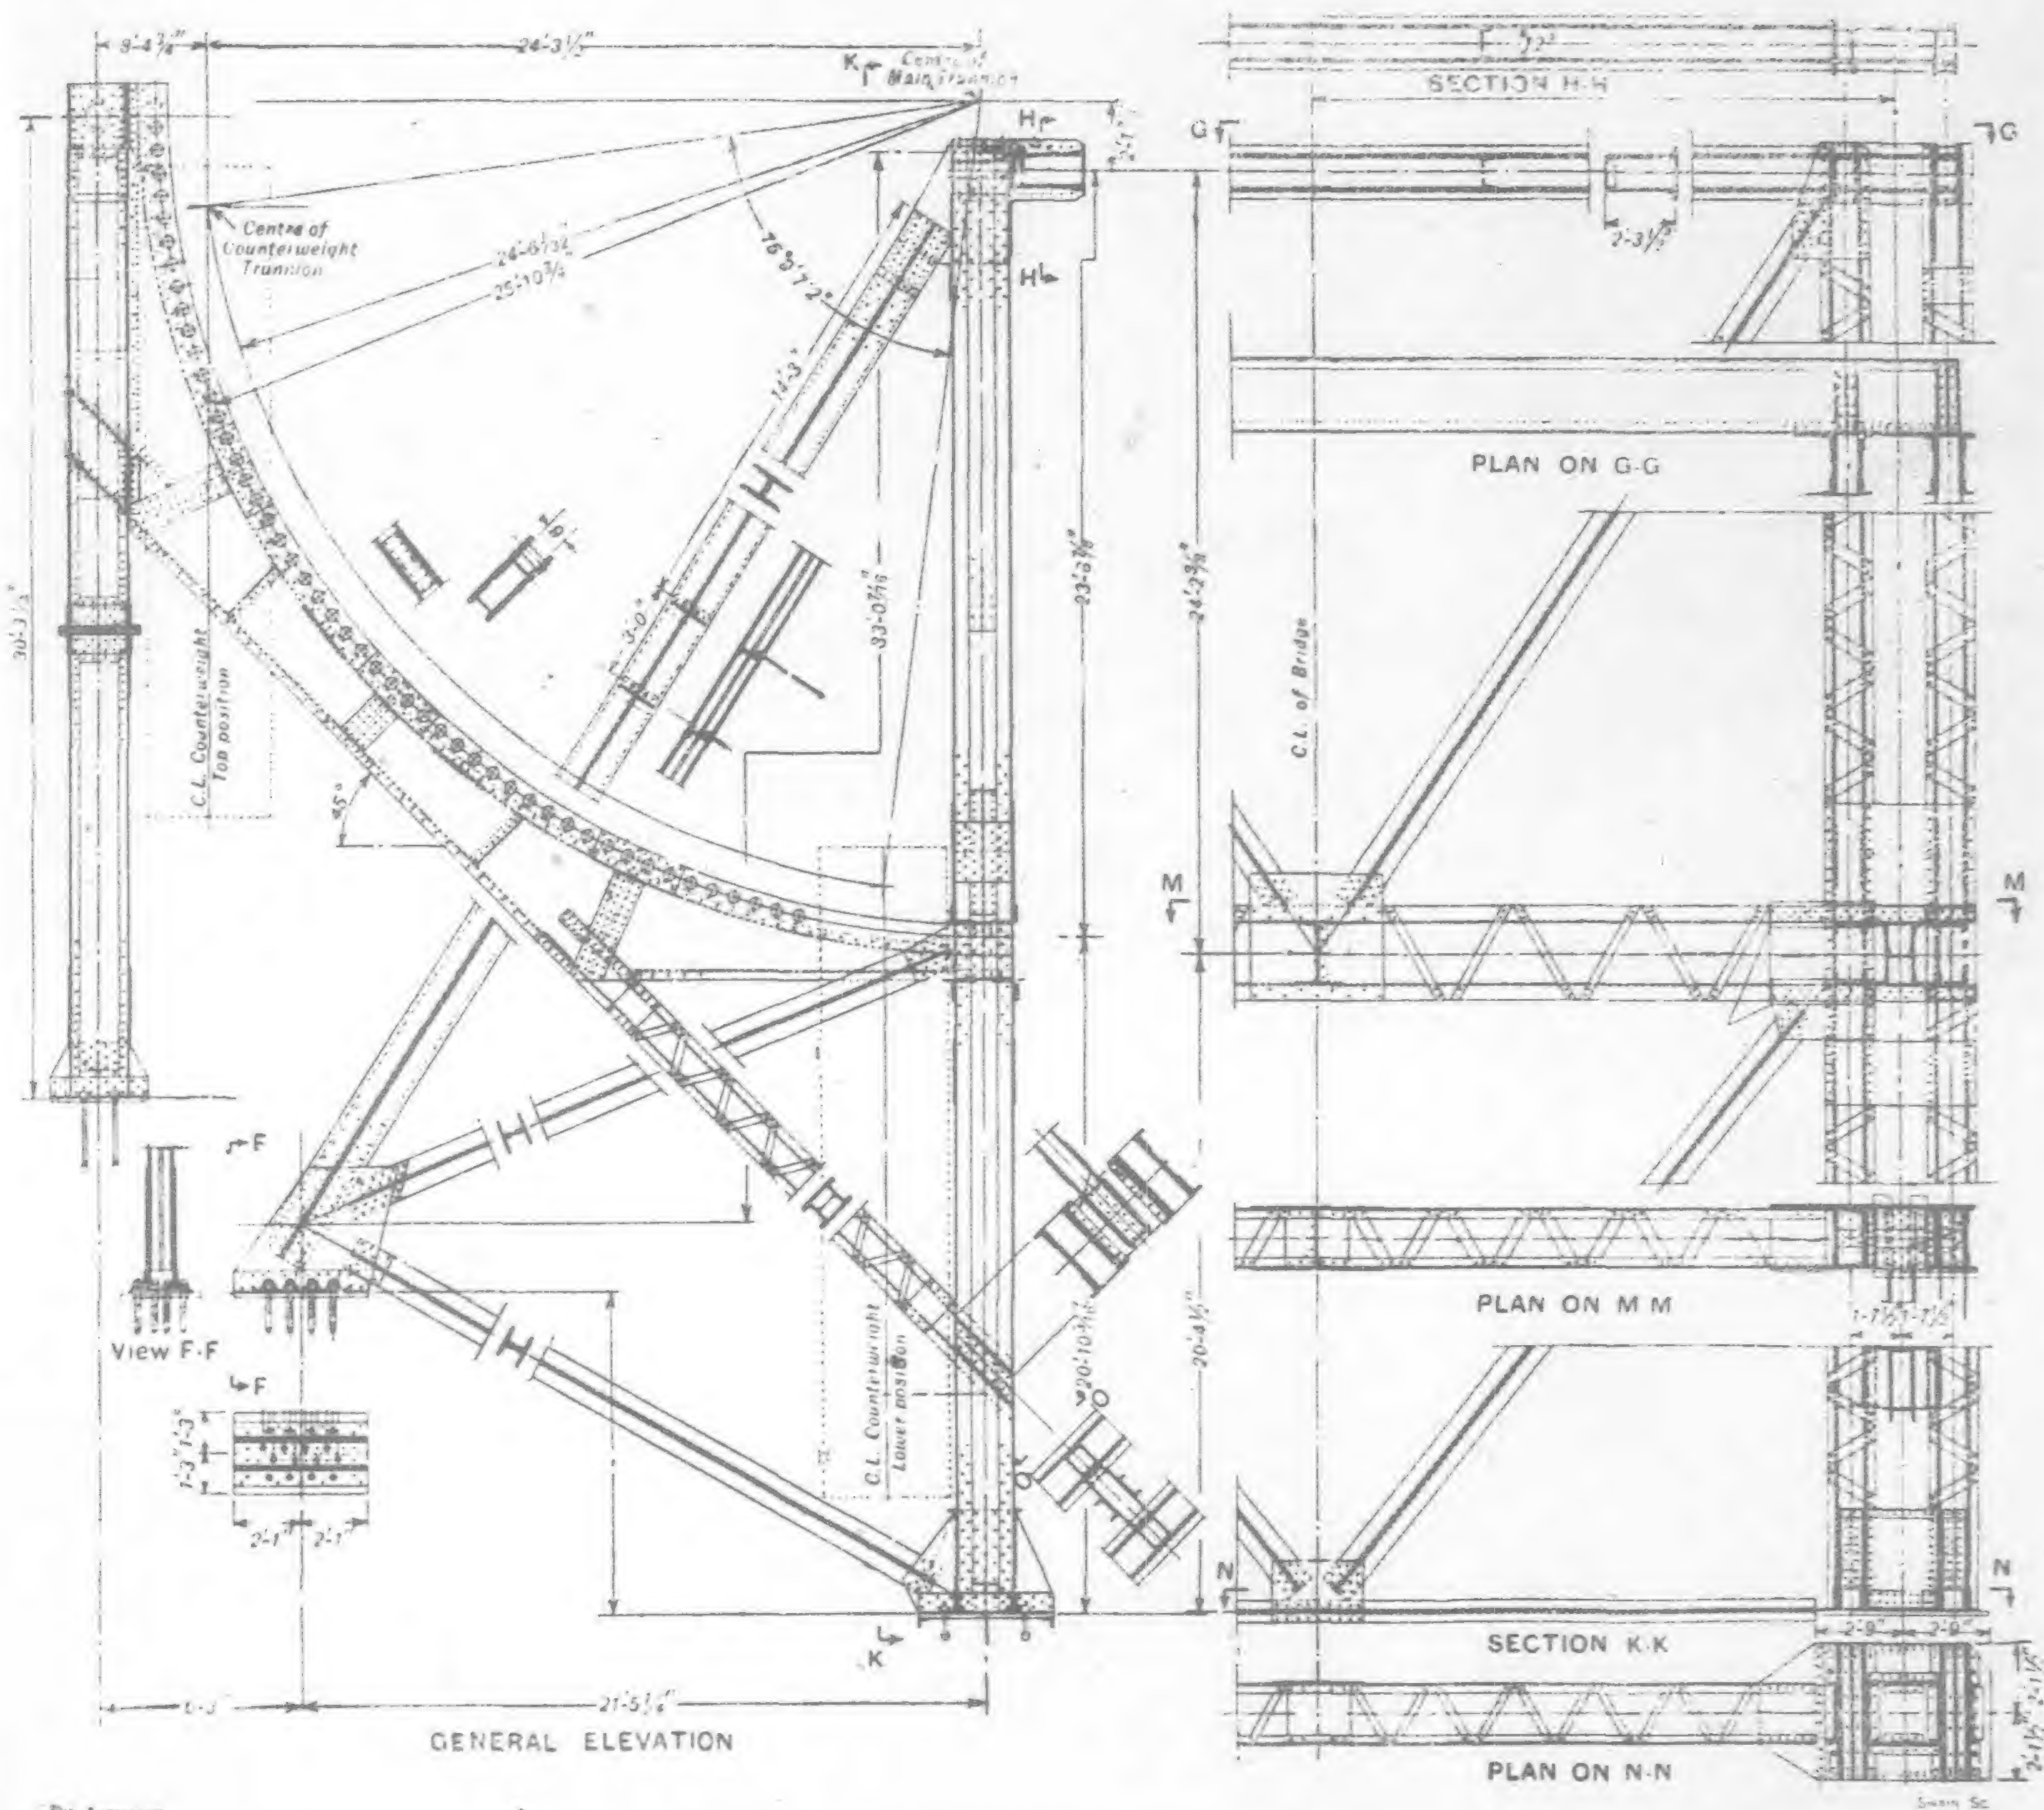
DETAILS OF STEEL FRAMEWORK WITHIN THE RIVER PIER
